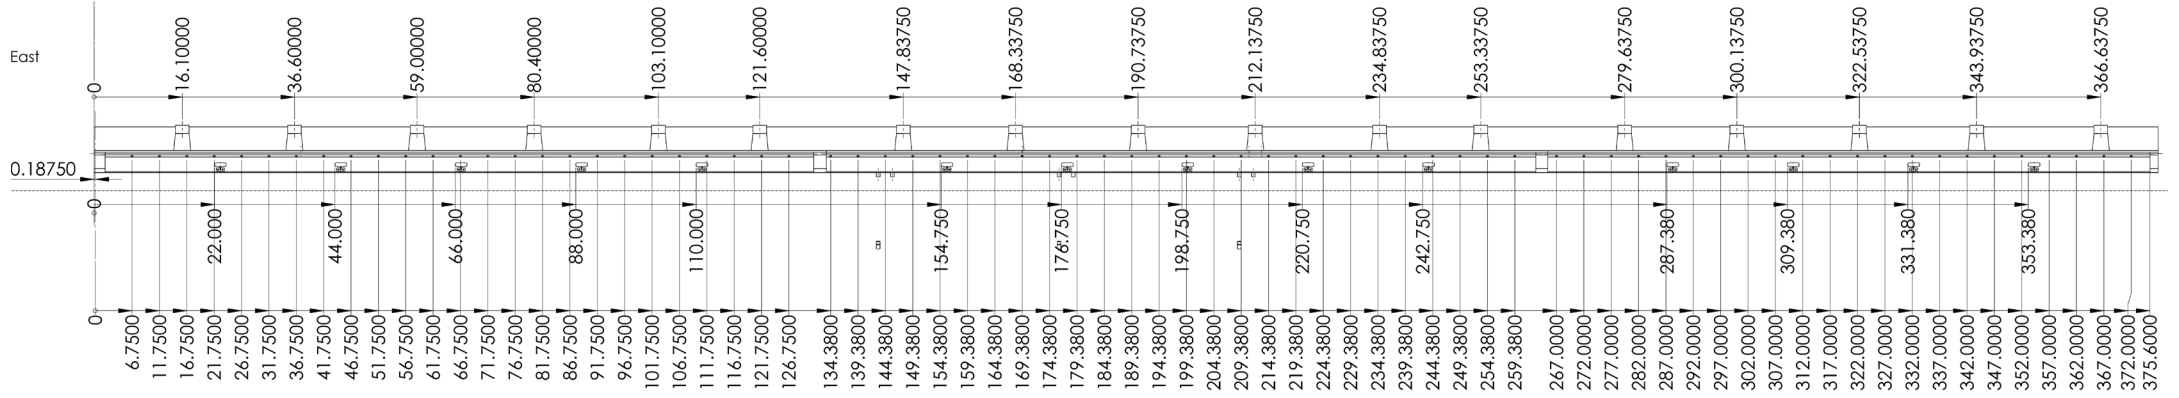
2D Drawing of East section. Spacer buttons, connectors, and supply hose locations. Dimensions in inches.
